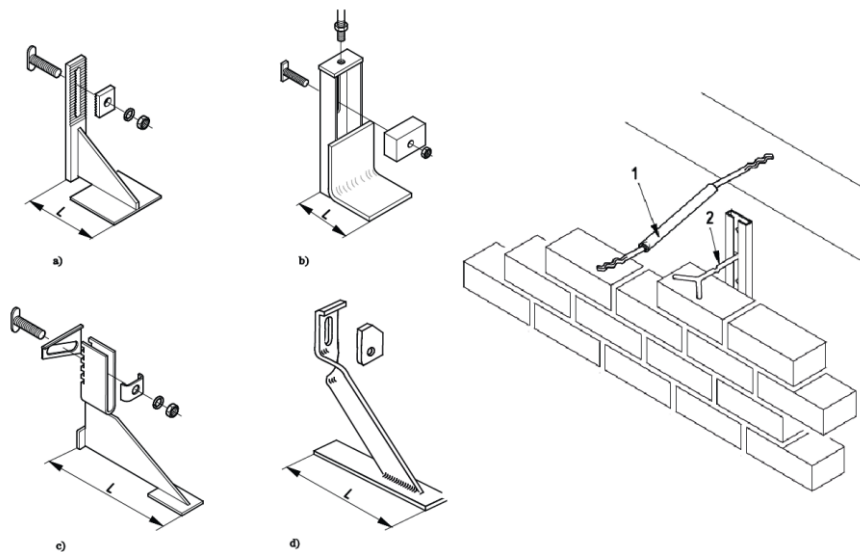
Examples of brickwork support brackets and movement-tolerant wall ties [xxx].
